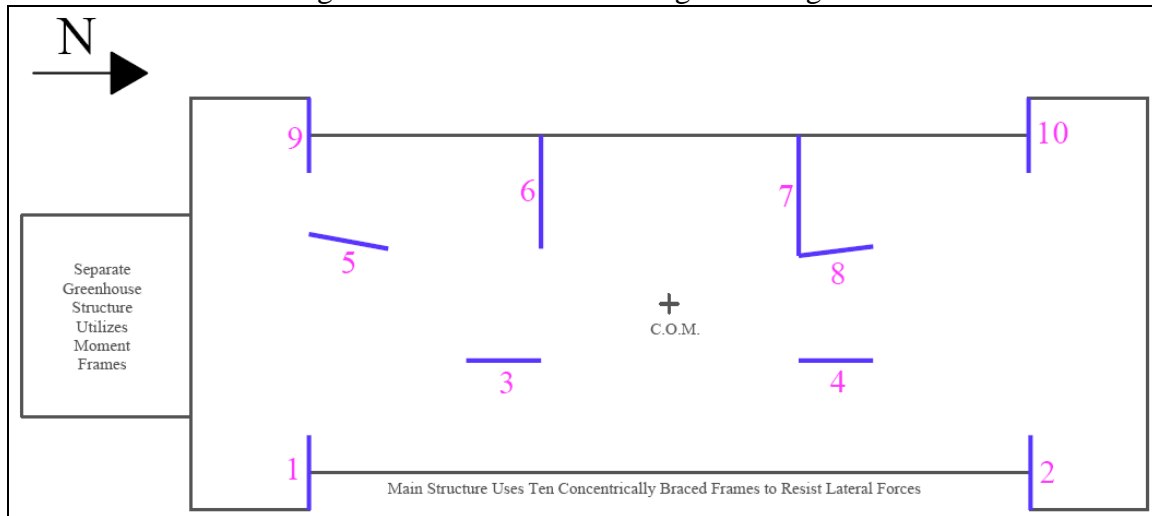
Layout of the 10 Concentrically Braced Frames
